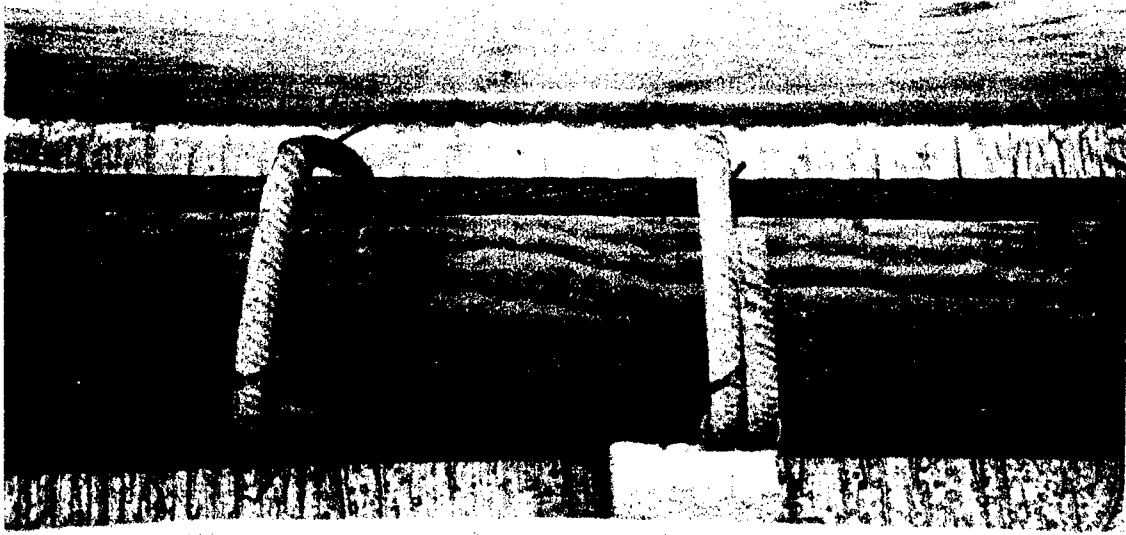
Details of reinforcement at the mid-portion of the columns
